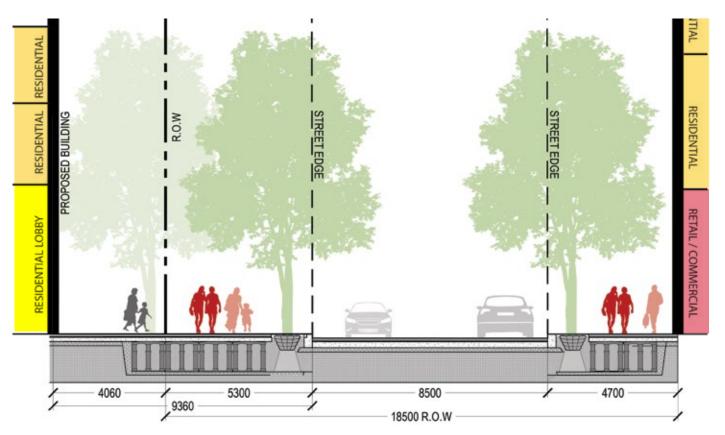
Section along South Loop (Street B) - Commercial / retail
